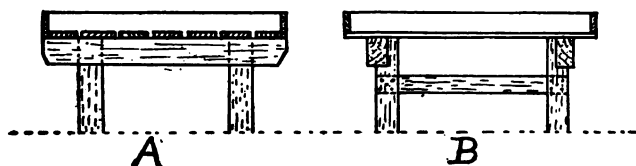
Two types of wood benches. A, bottom boards running lengthwise; B, bottom boards running crosswise
